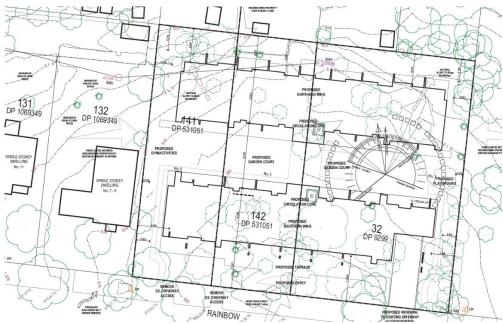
Proposed Site/Site Analysis Plan (Source: Coble Stephens Architects)
